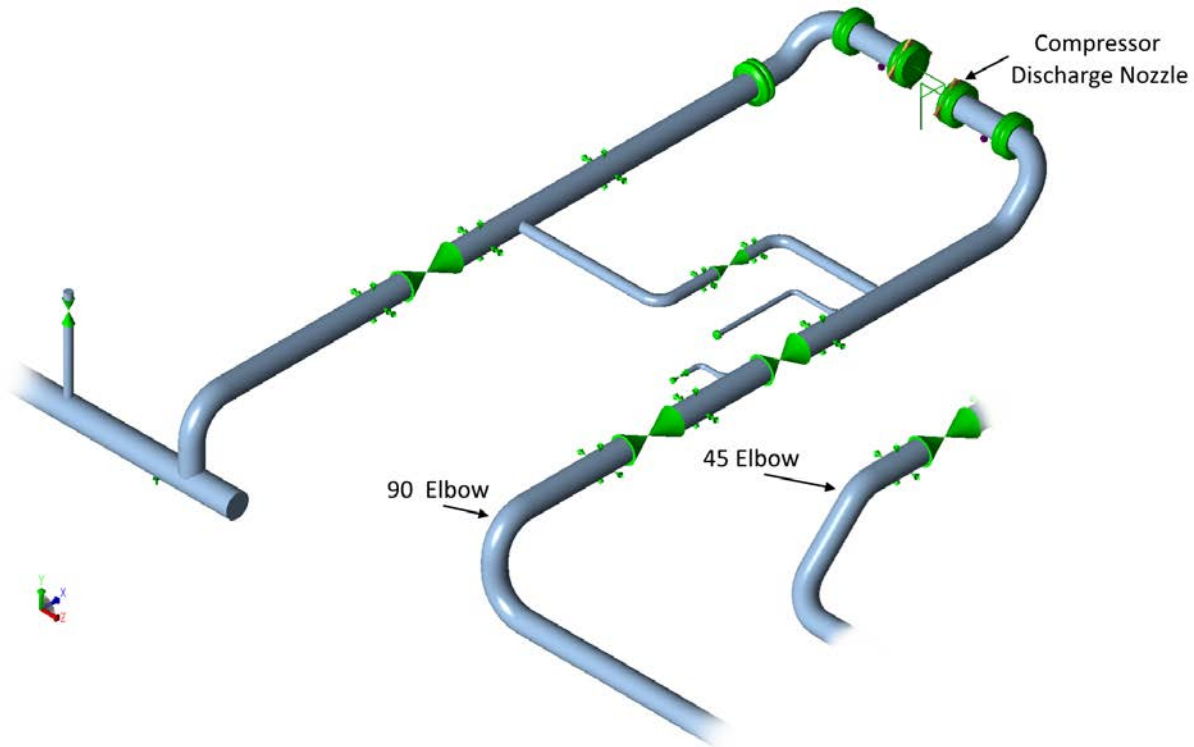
Example Compressor Layout using a 90° Elbow and 45° Elbow
